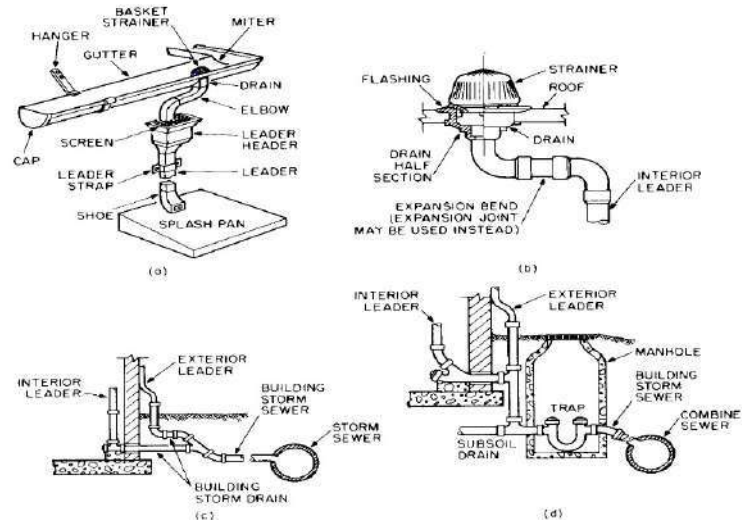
FIGURE: Elements of a storm-drainage system: (a) roof gutter, exterior leader, and splash pan; (b) roof drain and top portion of interior leader; (c) piping to a storm sewer; (d) piping to a combined sewer.
